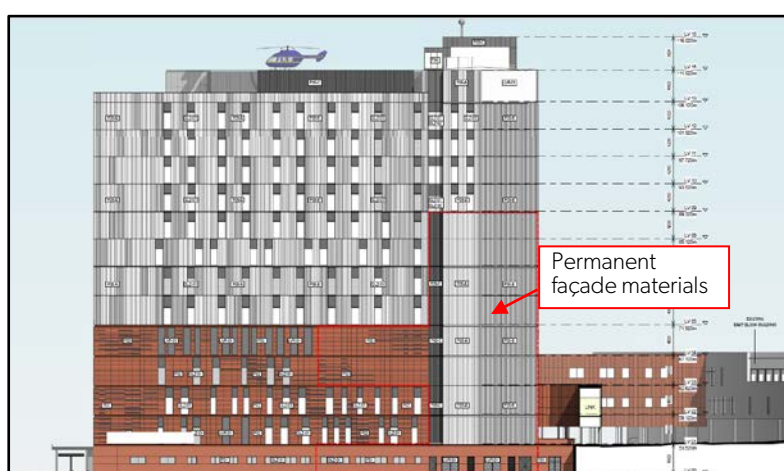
| Proposed Western Elevation Option 2 – Permanent façade (Source: Modification Application)
